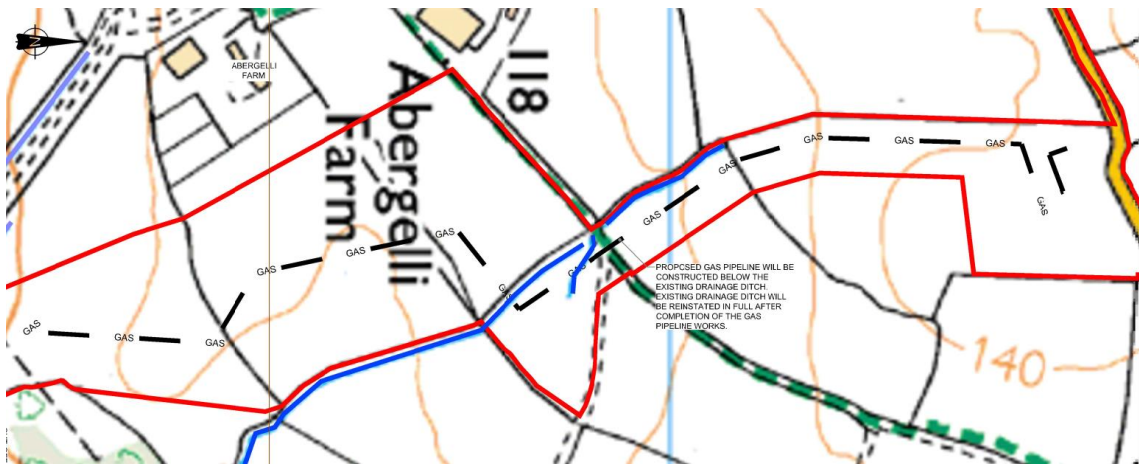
Plan showing nearby drains and watercourse to the site (North section)
